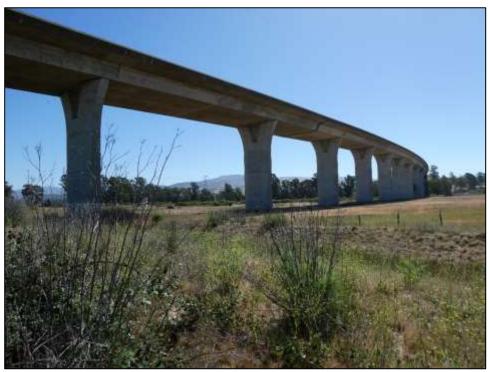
North elevation, camera facing southeast, June 1, 2022.
